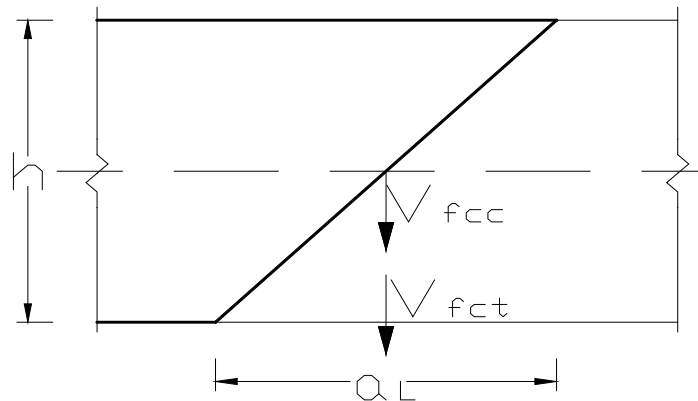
Superposition of shear force in the fiber-reinforced concrete beam without stirrups (SP-52-104-2007)
